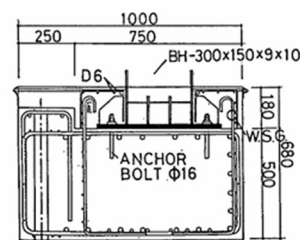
(a) Longitudinal section of D-Type specimen (unit mm)
